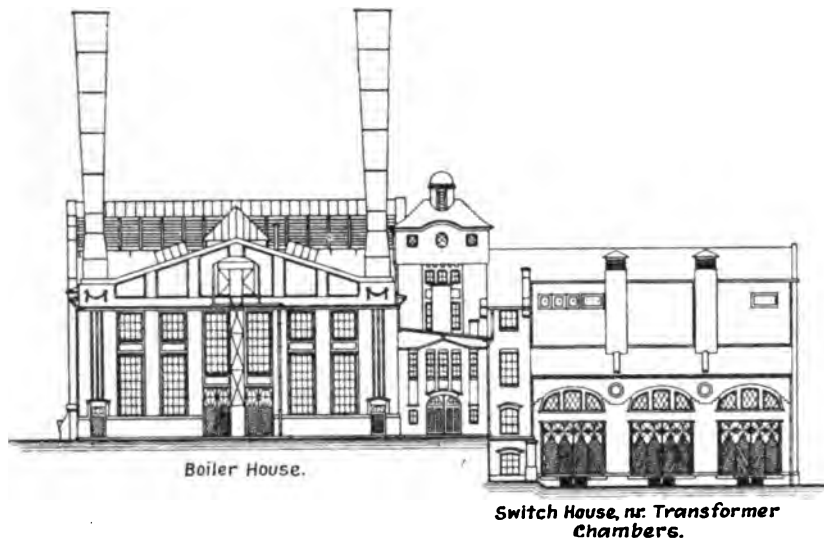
Architectural Example—Façade of the Obererzgebirg Electricity Works.
